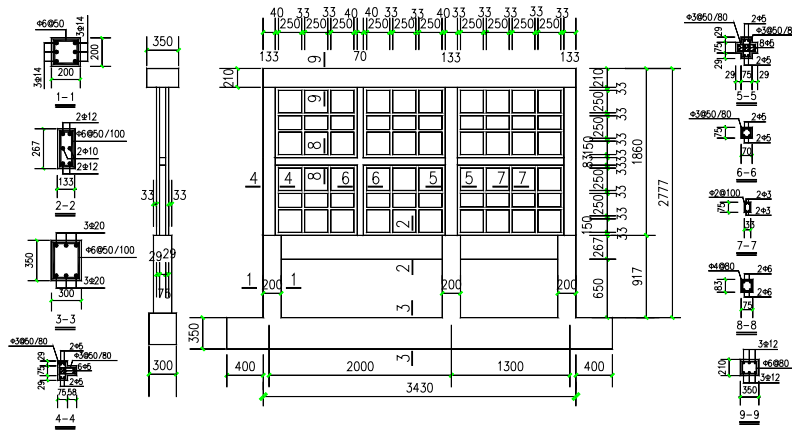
Geometry dimensions and reinforcement details of specimen KZML-4
